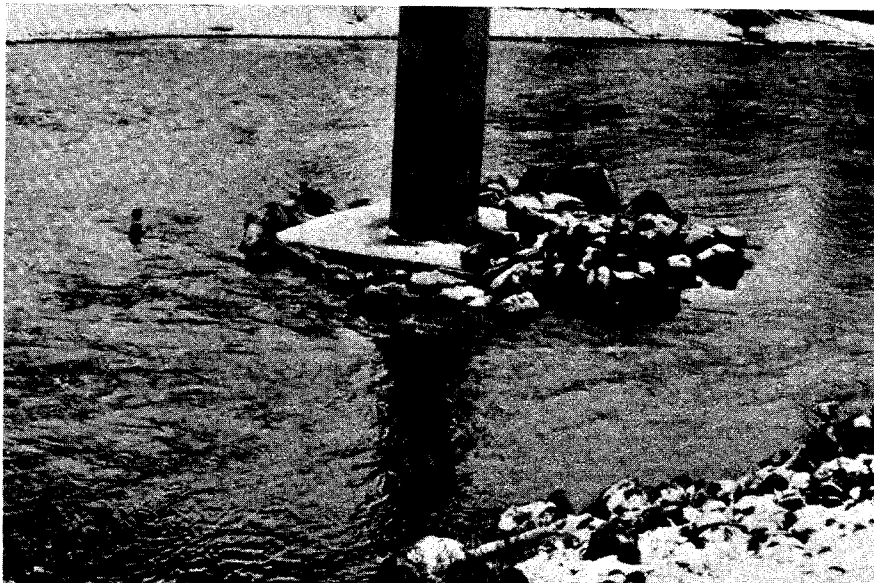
View of rock riprap placed around pier footing after constructing grout curtain, McKenzie River. (From Oregon Dept. of Highways.)
